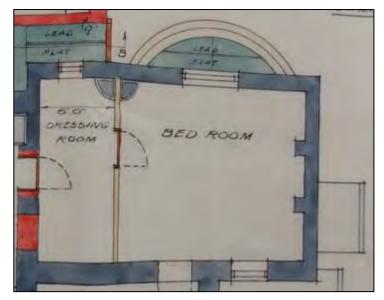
Extract from the 1929 plans showing Room 37 (BARS ref: RDB P 1/1314)
